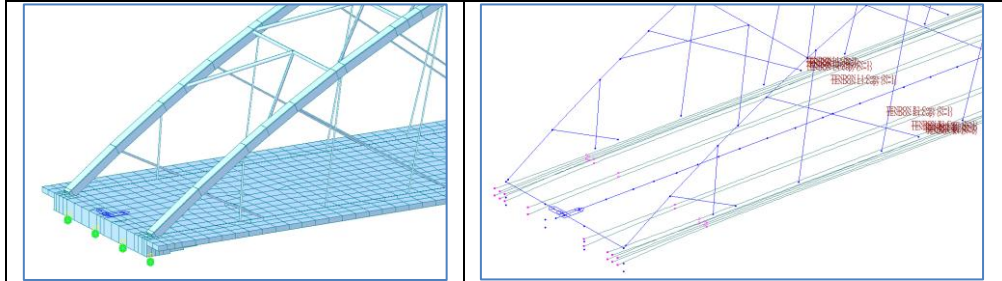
3D plate elements model and beam element with prestressing tendons.
